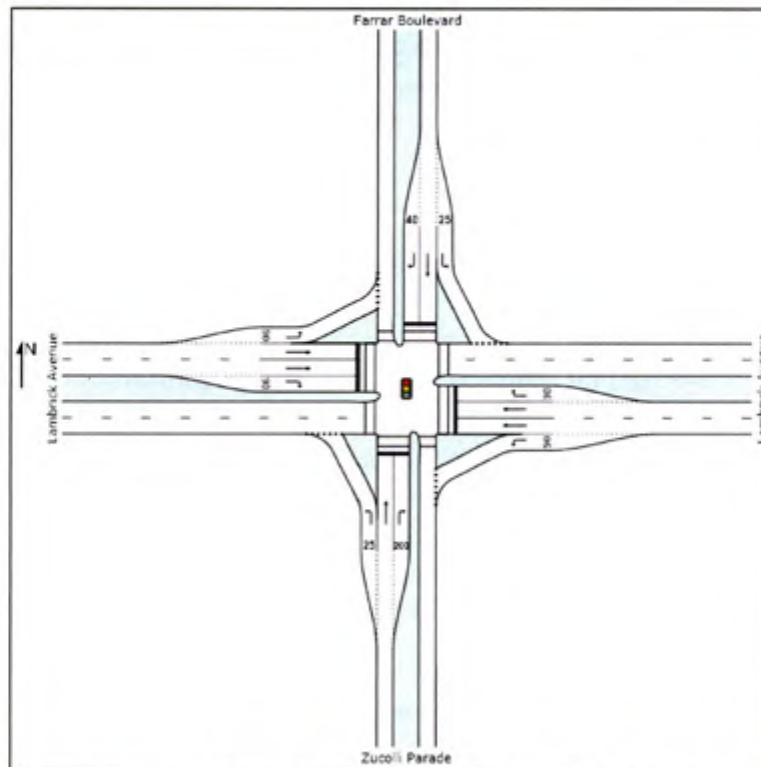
Farrar Boulevard / Lambrick Avenue / Zuccoli Parade intersection
